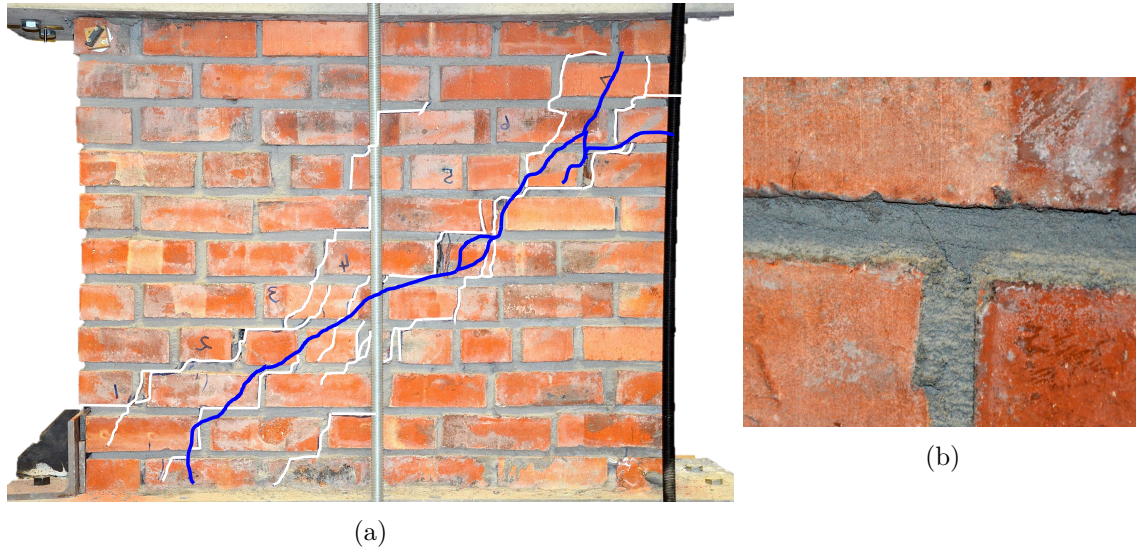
SW-220-15-1 (a) Masonry crack pattern; (b) Focused on masonry crack initiation.
